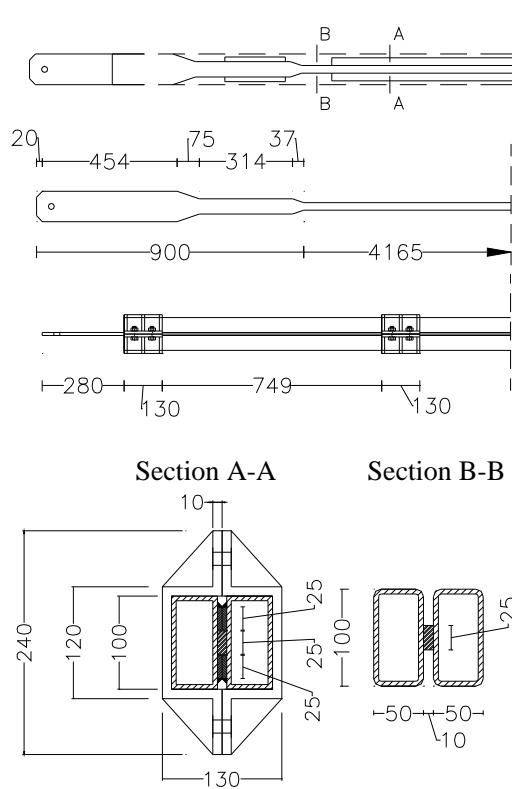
Geometry and details of a BRB tested within the ILVA-IDEM project (Mazzolani et al., 2009).
